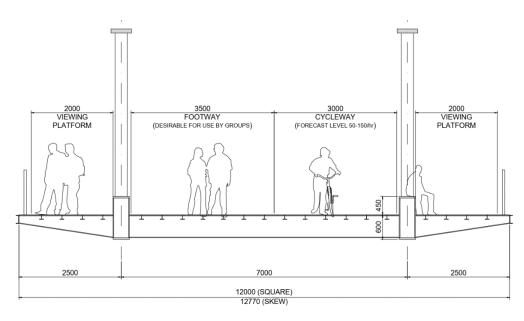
Option 1 bowstring arch bridge cross section.
